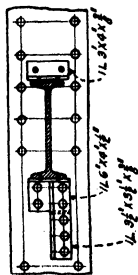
Standard connections beams to columns for 15-in. I-beams with reactions not more than 37,000 lb.
